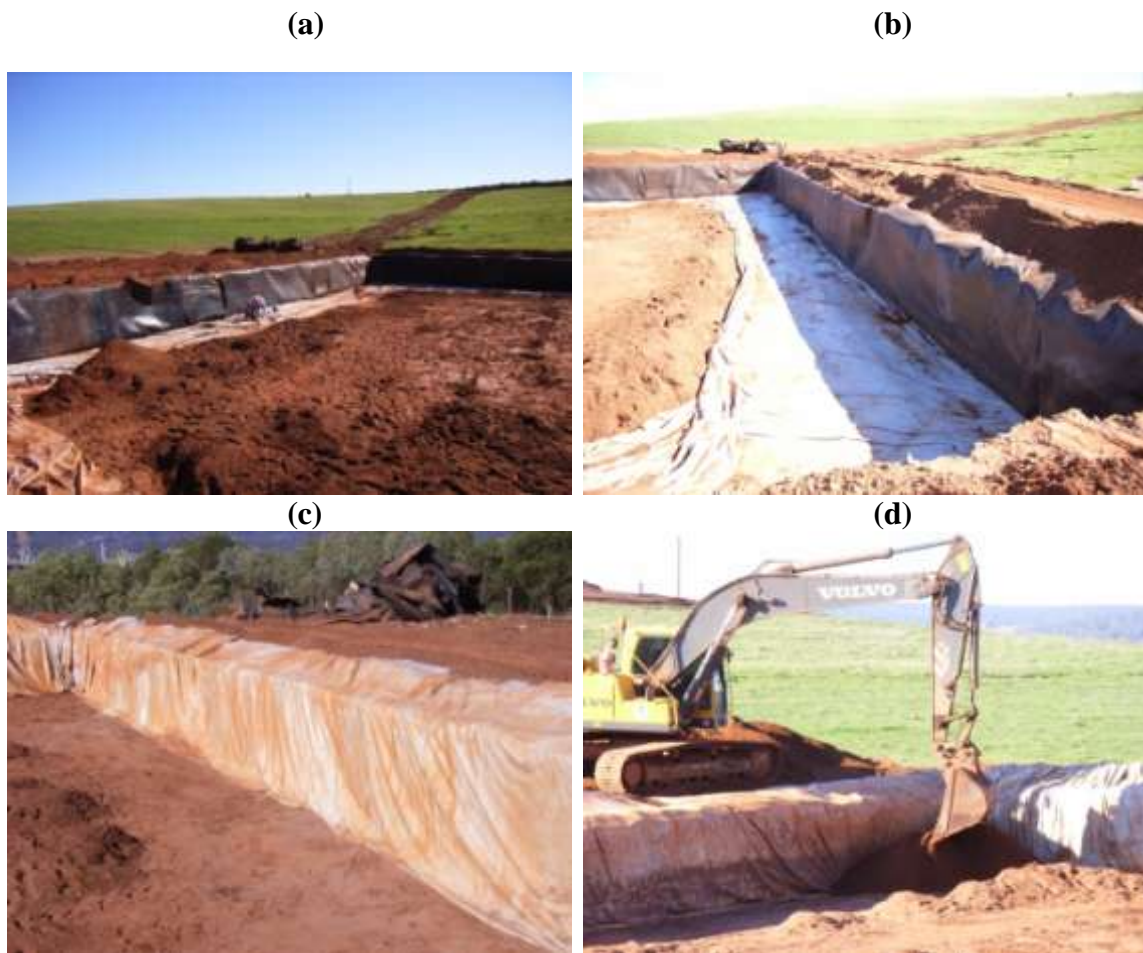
(a) Repairing small tears in PVC liner, (b) installing protective HDPE along walls of lysimeter before pulling PVC liner up, (c) PVC liner pulled up vertical walls and over small bund, and (d) commencing filling of 2nd lift with gypsum-amended residue sand
